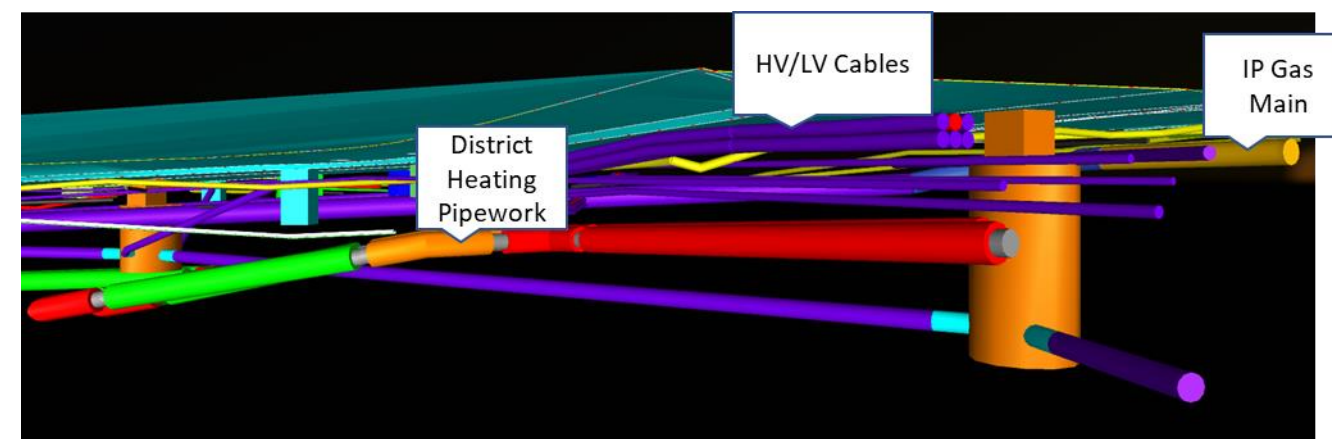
Pipework routing at eastern end of Surrey Canal Road - Heading towards Folkstone Gardens
